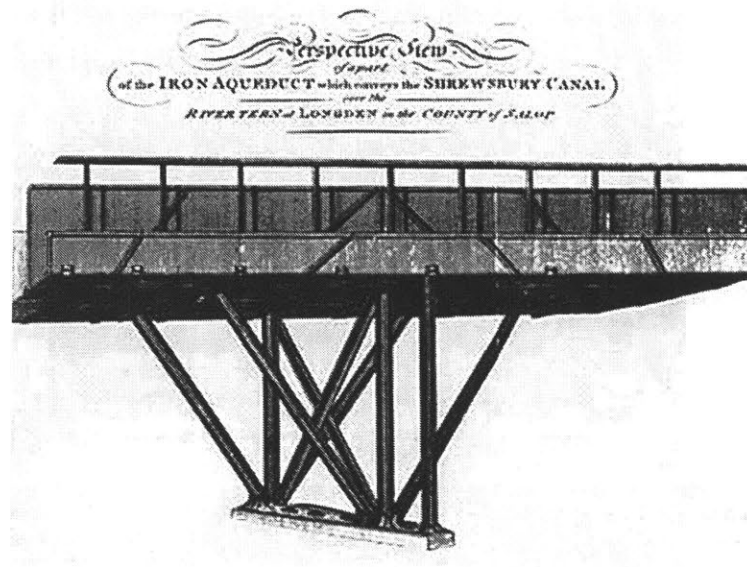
Longdon-on-Tern Aqueduct, showing cast-iron plates and bracing (*Shrewsbury and Newport Canal n.d.*)
